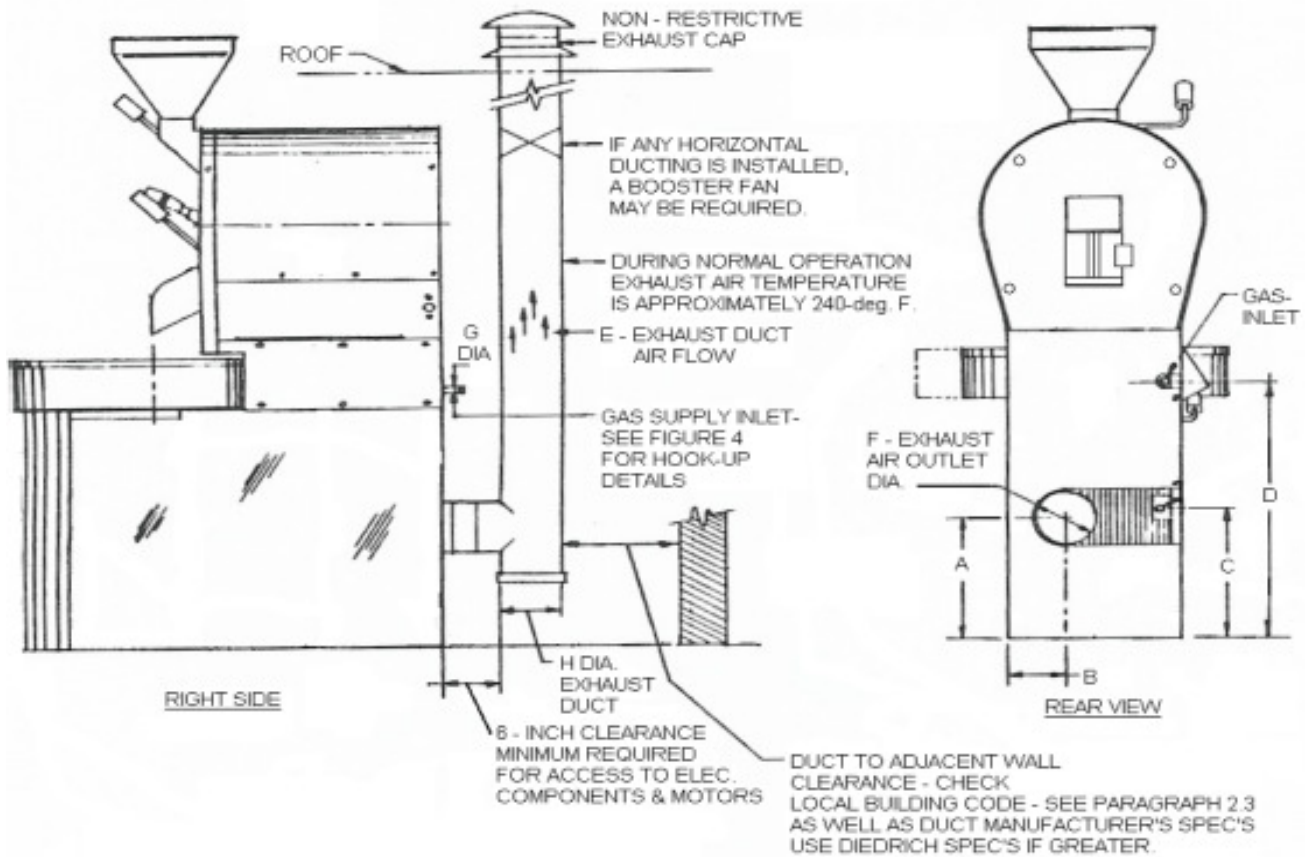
INSTALLATION HOOK-UP DIMENSIONS FOR EXHAUST AIR DUCT AND ELECTRICAL JUNCTION BOX
